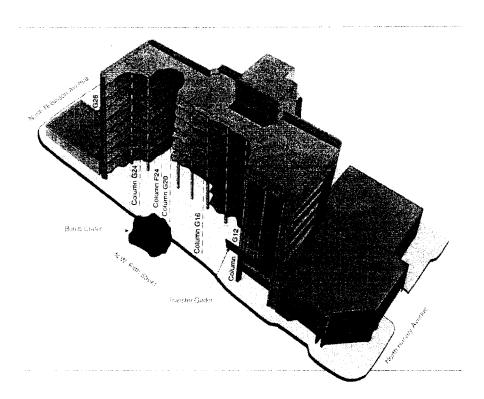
Post-blast structure of the Murrah Federal Building [2]
